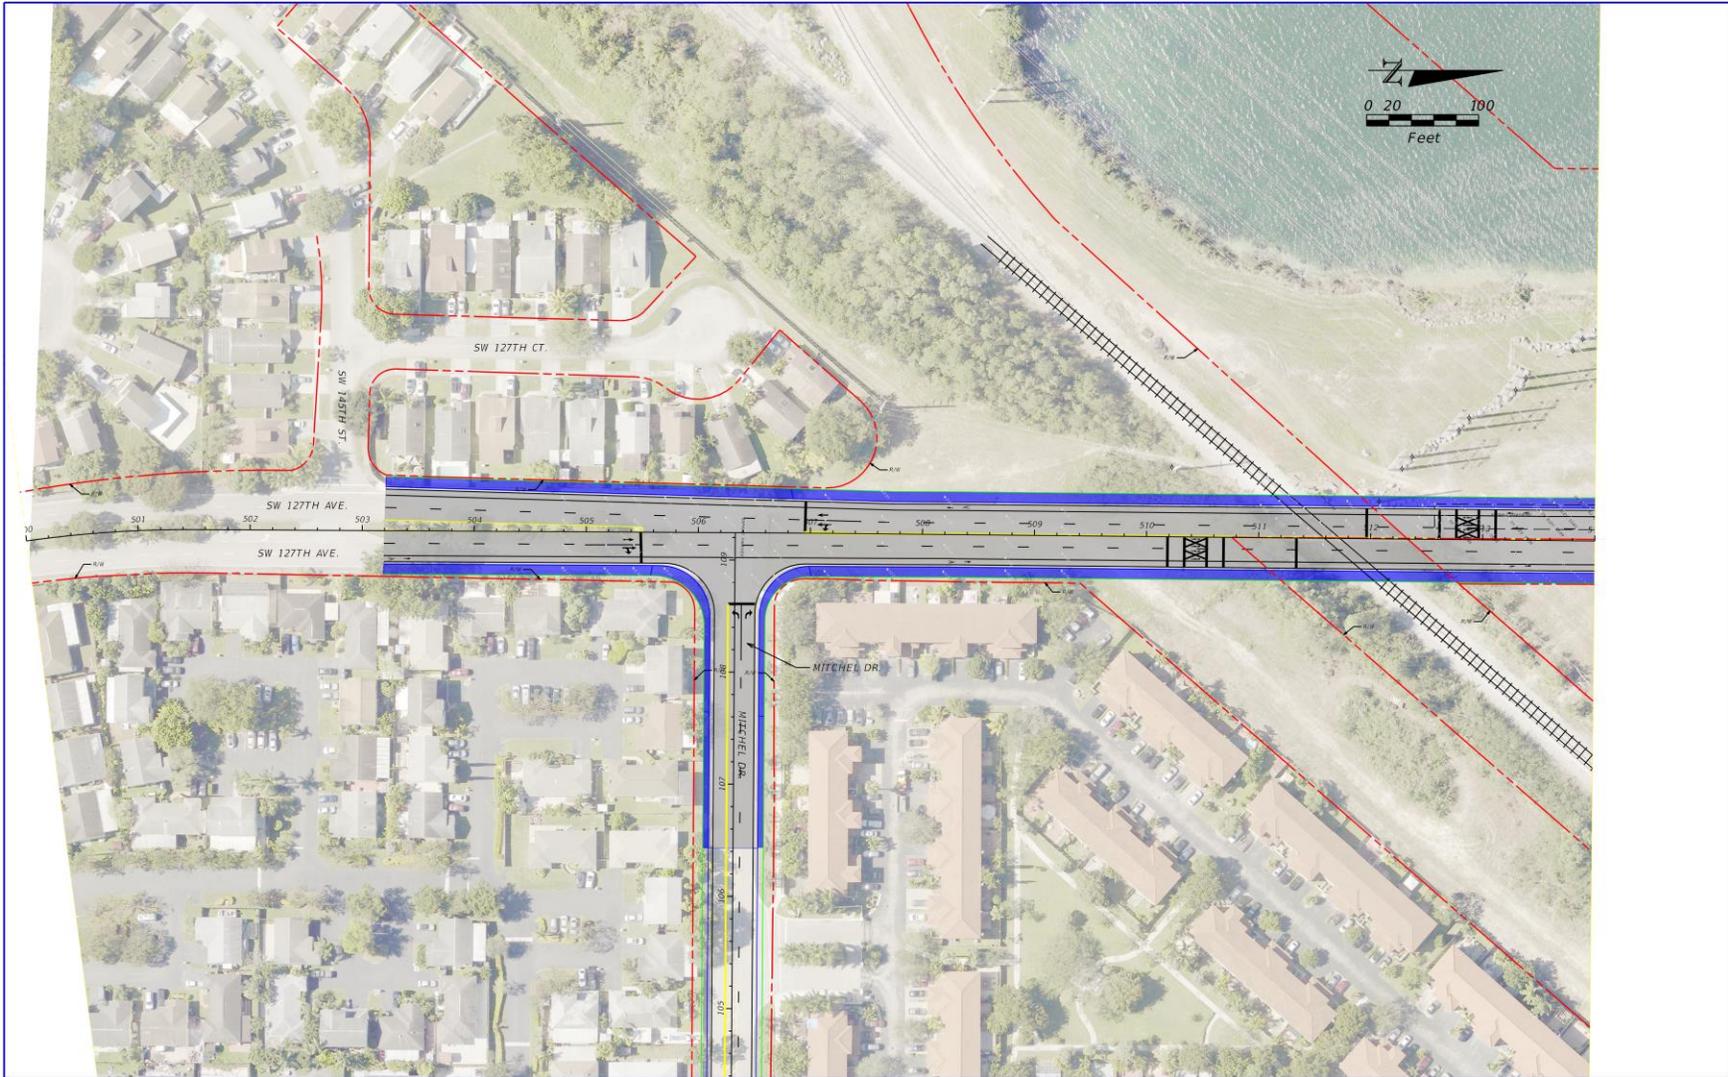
Alternative 1 – At-Grade (Section B) – Plan View (Continued)
